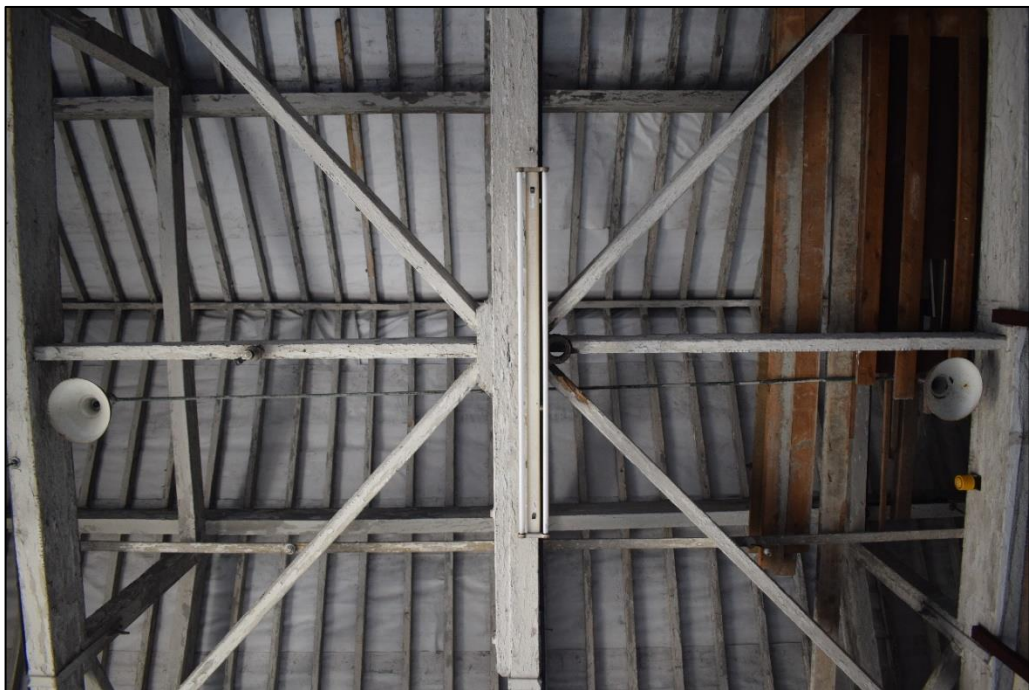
Roof structure within goods shed showing metal eye (centre) attached to tie beam Photo CPAT 4574-0044
